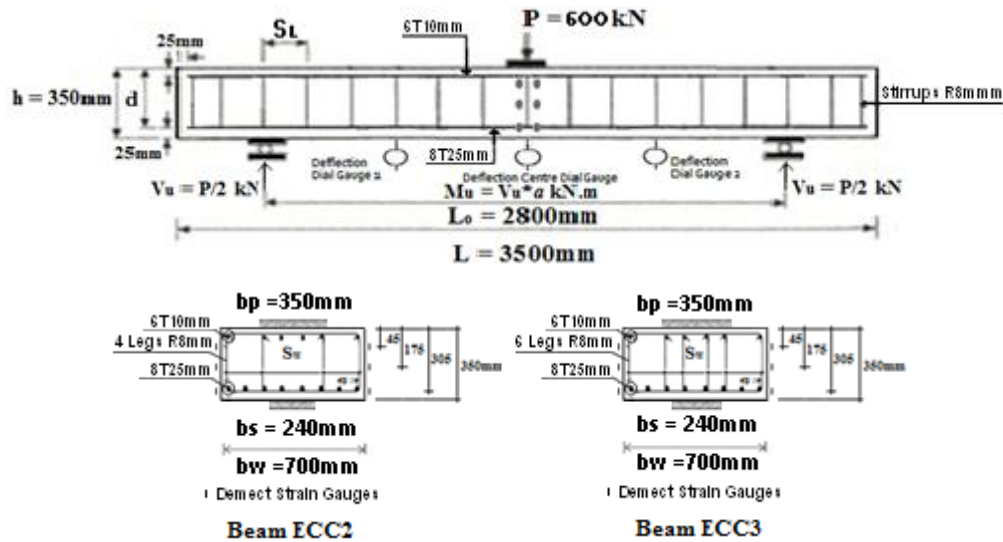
Design of Wide Beam Specimens in Test-Series "A".
